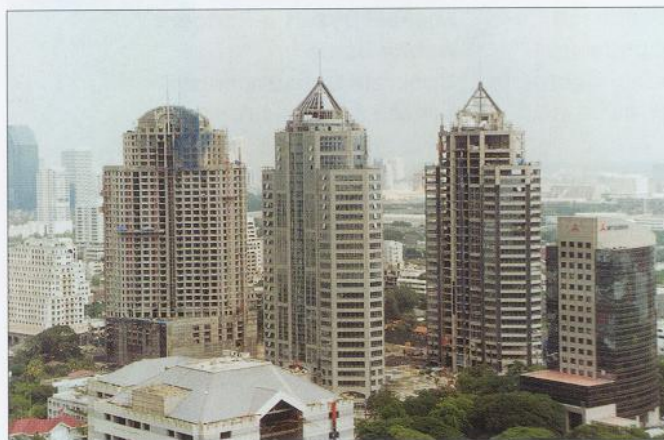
THREE OF THE 5 TOWERS UNDER CONSTRUCTION
